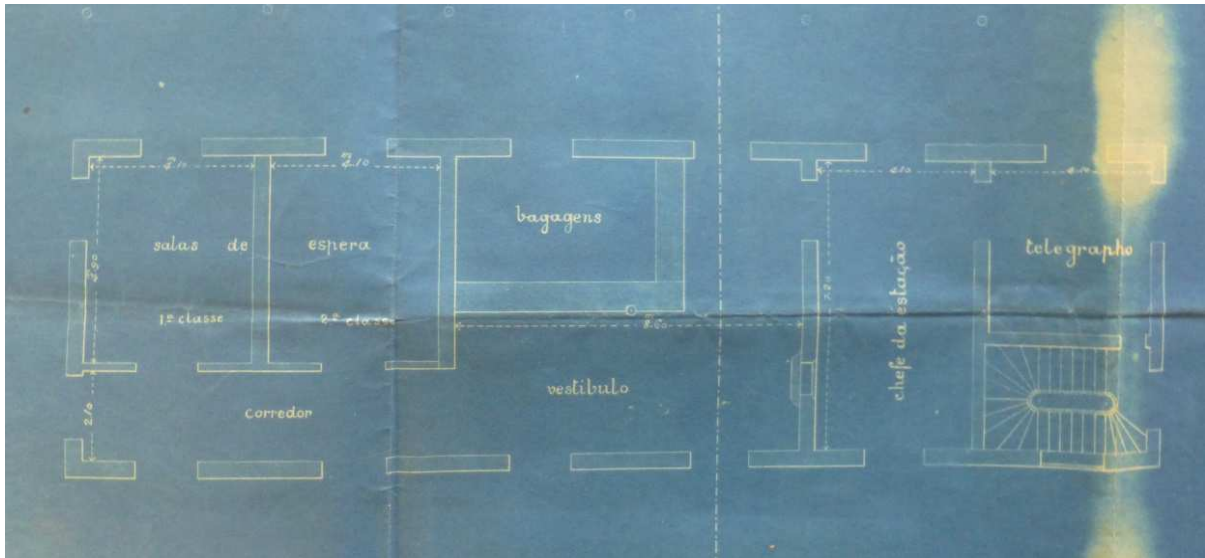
Plan of the ground floor of the S. Sebastião terminus station building, 1910.
